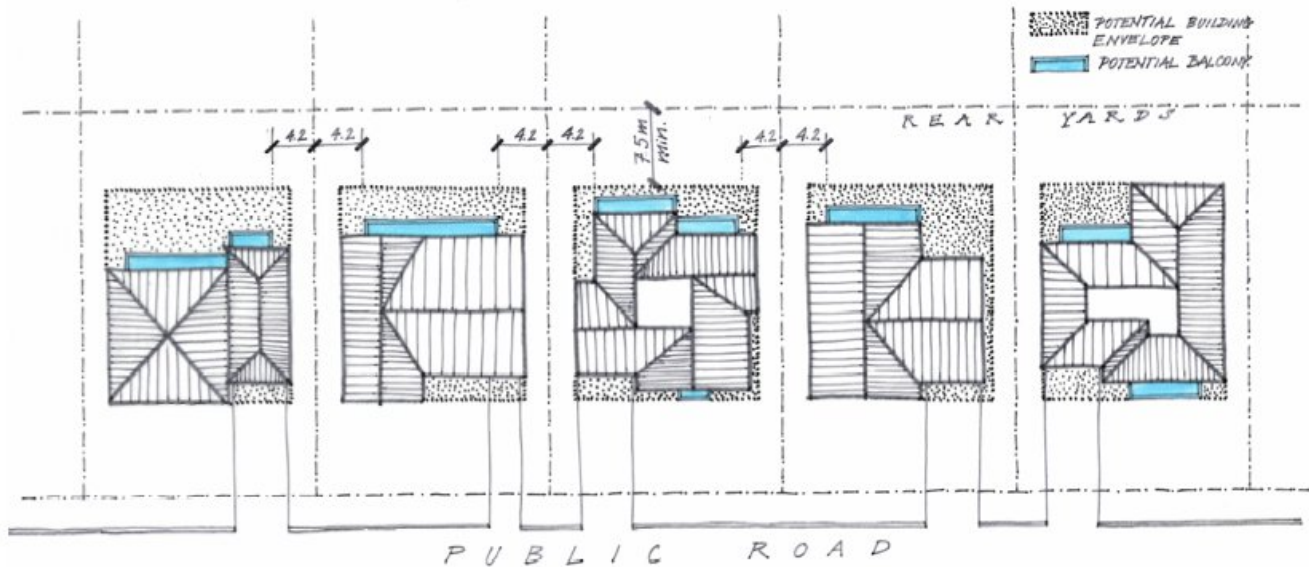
Plan view of potential balcony placement. (Source: Balconies Staff Report, 2017)
